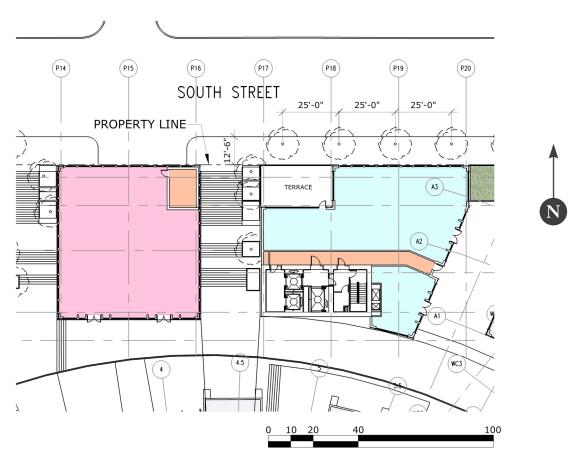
| SOUTH ST RETAIL LEVEL 200 PLAN
